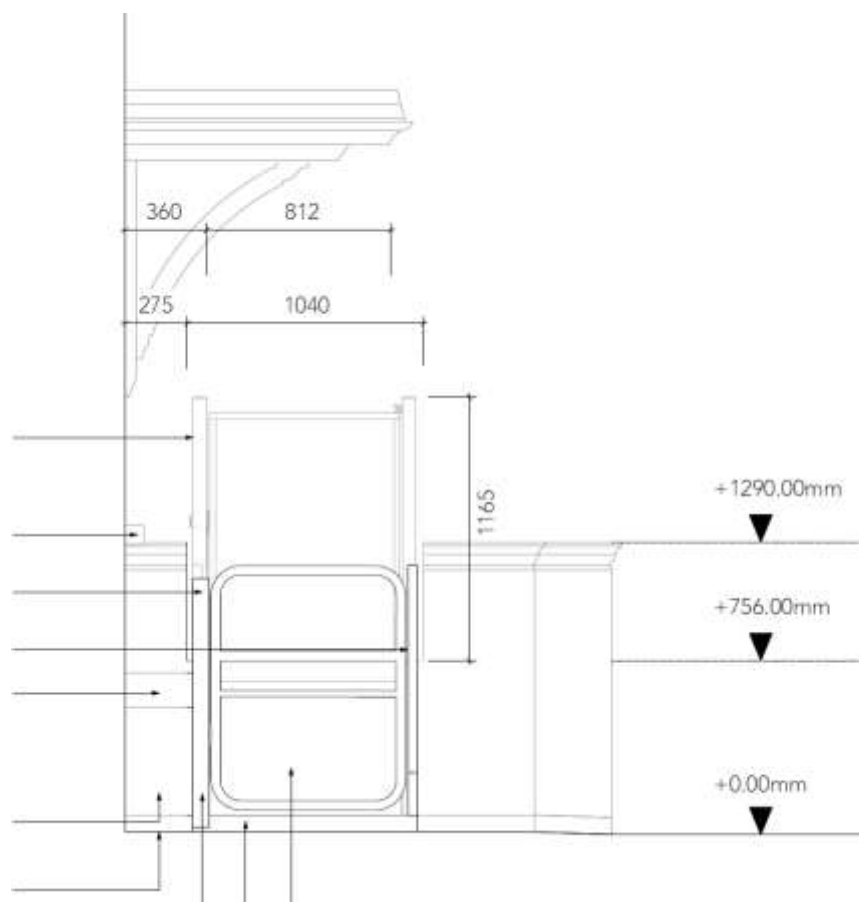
The proposed Elevation AA, indicating the majority of the new lift sits below the coping of the low wall surrounding the entry landing.
